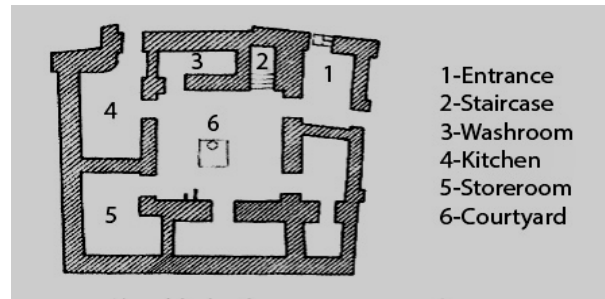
Plan of House at Ur, Mesopotamia (Al-Dawoud, 2006).
